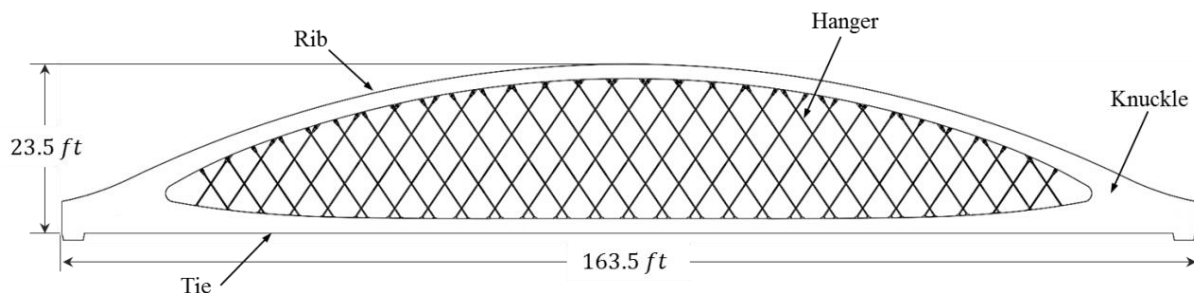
Geometry of a network arch in the West 7<sup>th</sup> Street Bridge
